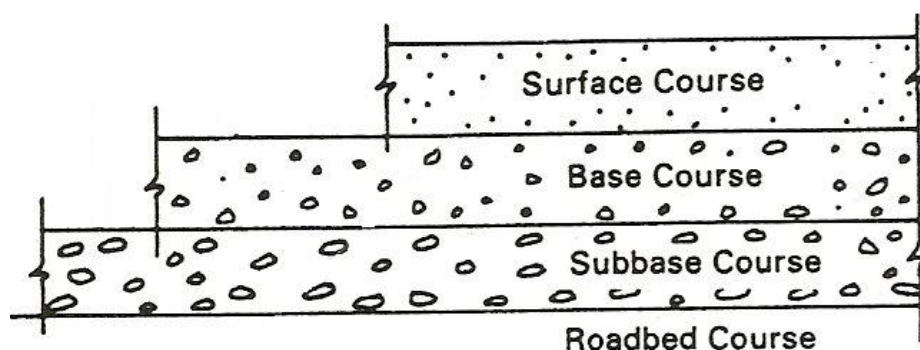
Flexible pavement structure (after AASHTO, 1993).
